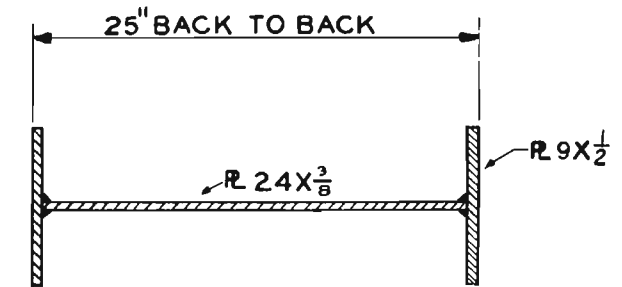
Cross section through welded plate girder equivalent to 21-inch 63-pound rolled beam.
